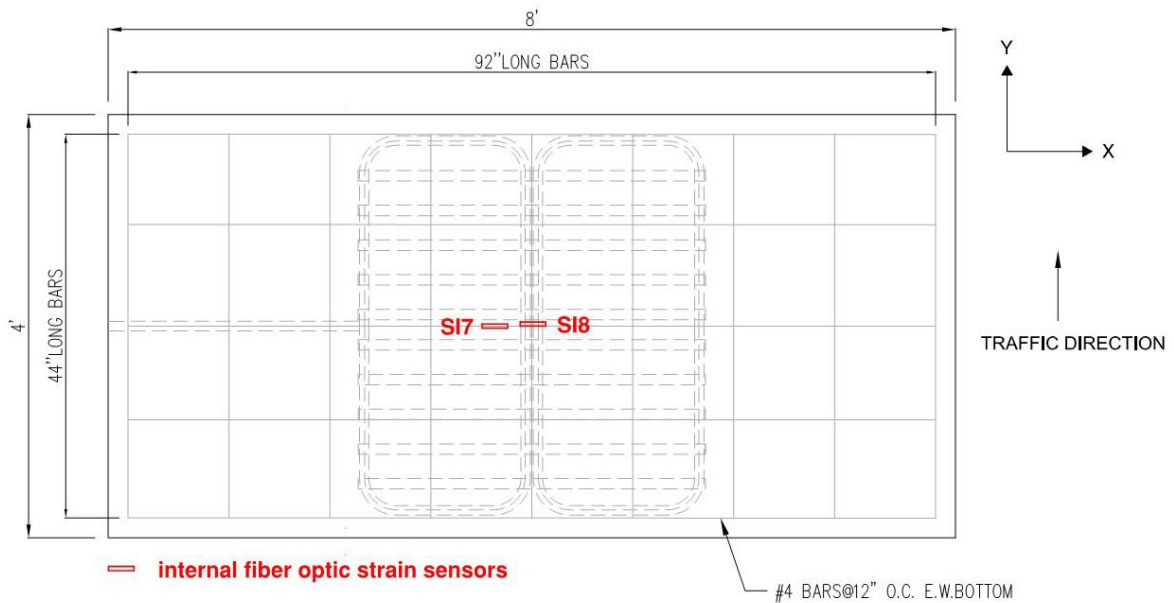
Instrumentation plan for typical panels – bottom mat of reinforcement, plan view
